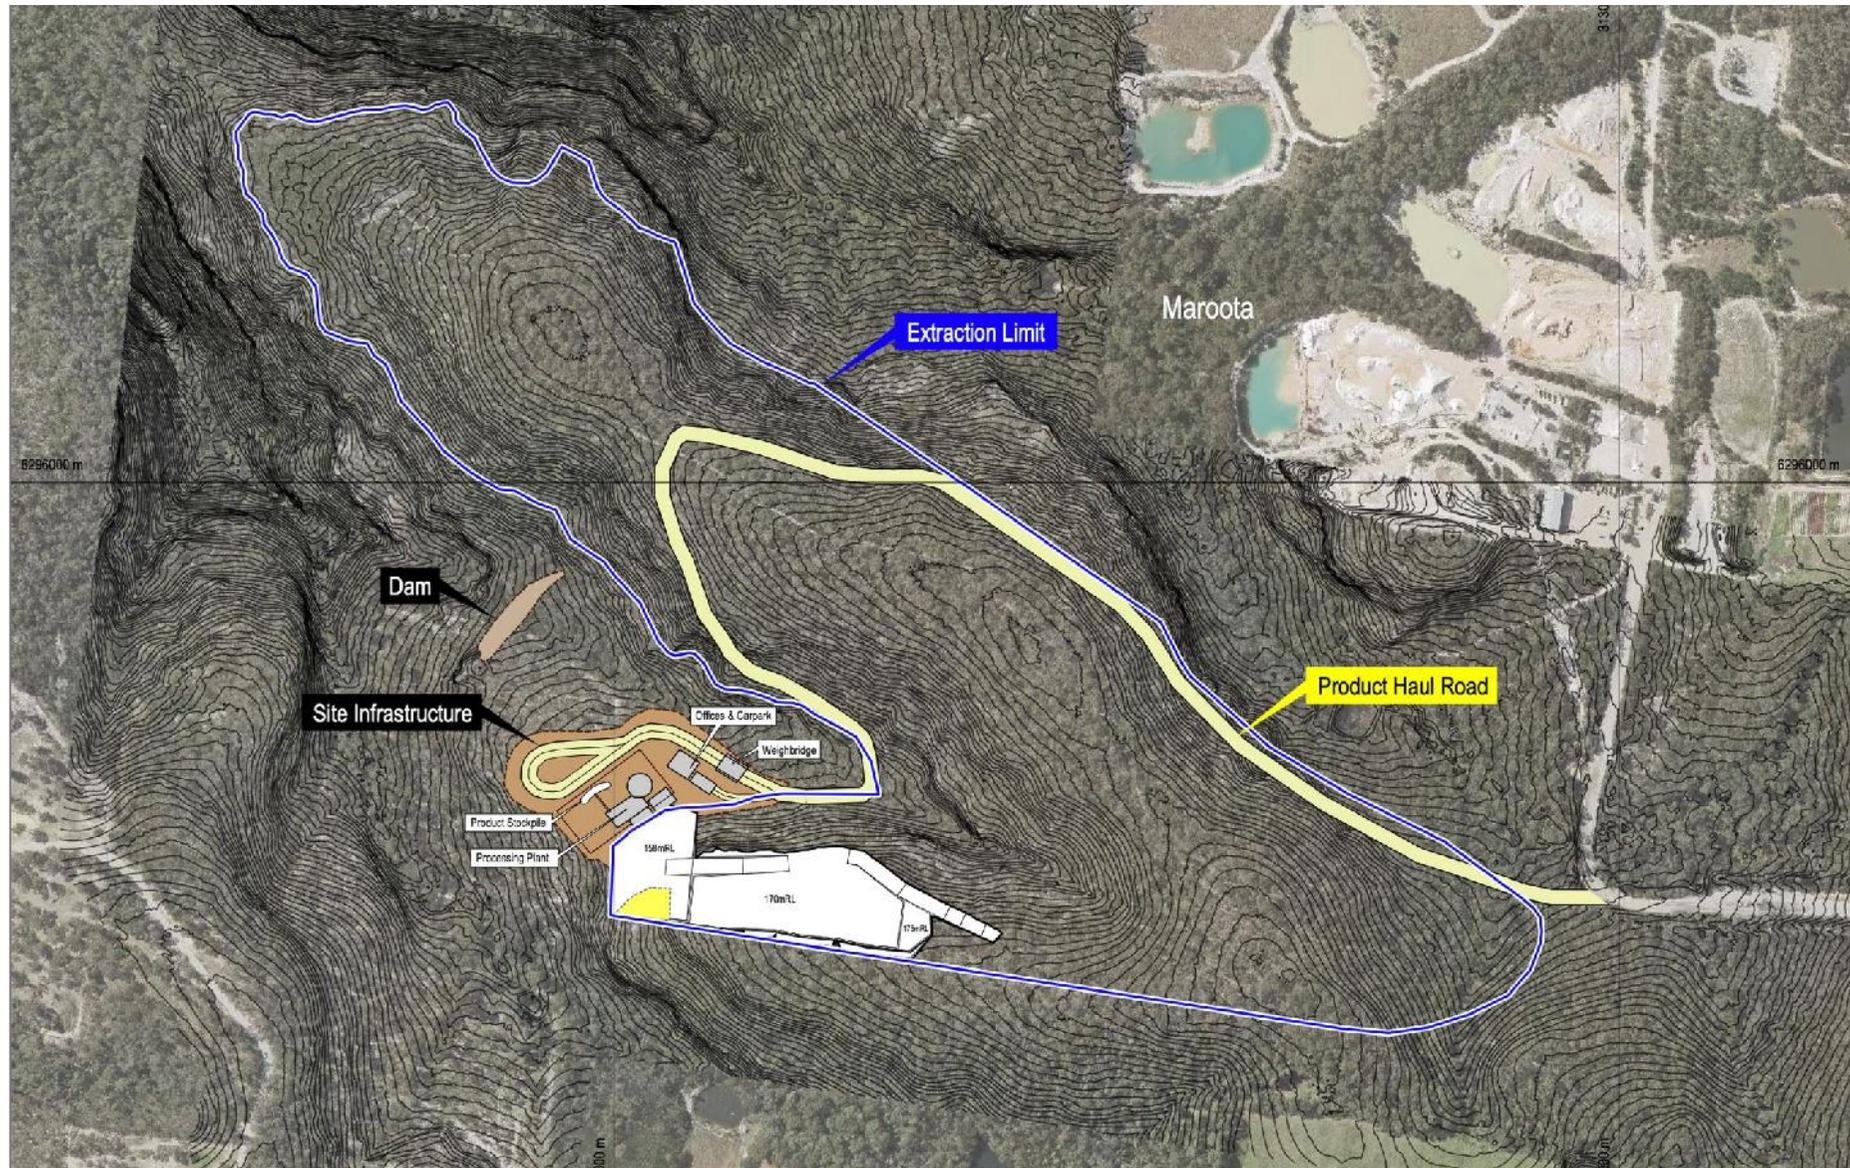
Site Layout Plan (Source: RPM Global, 2021)
